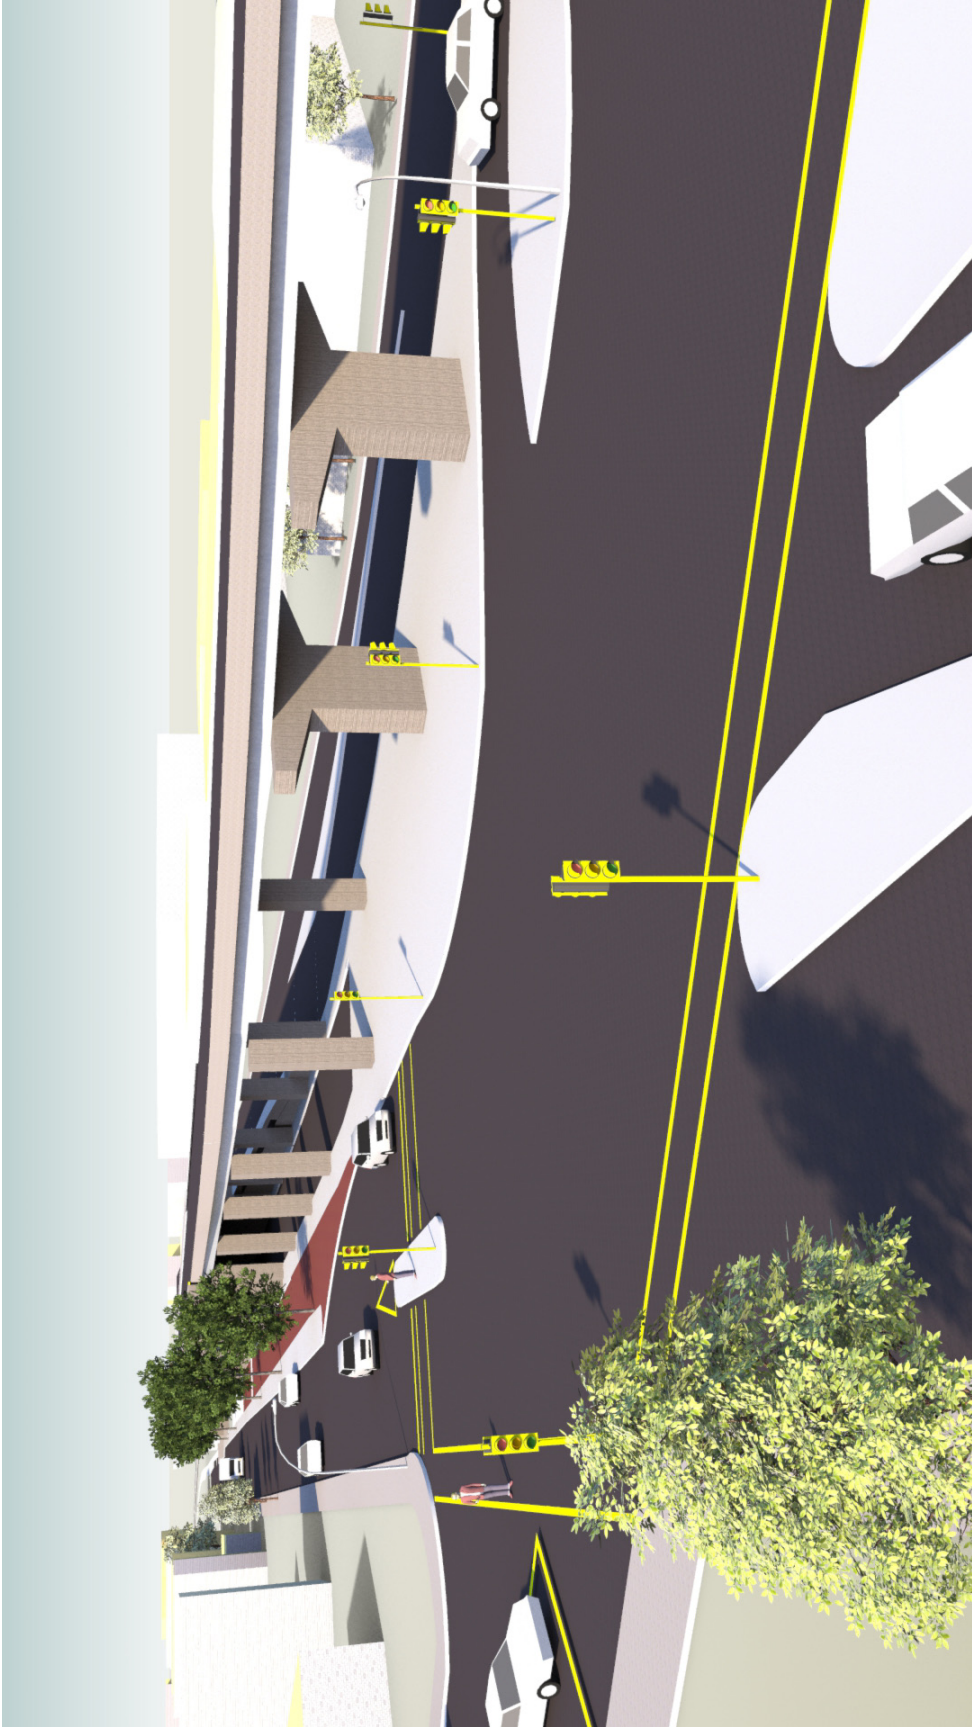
Visualization (looking north toward Washington St) of McGrath Highway southbound frontage road with the proposed removal of Somerville Ave down ramp.
